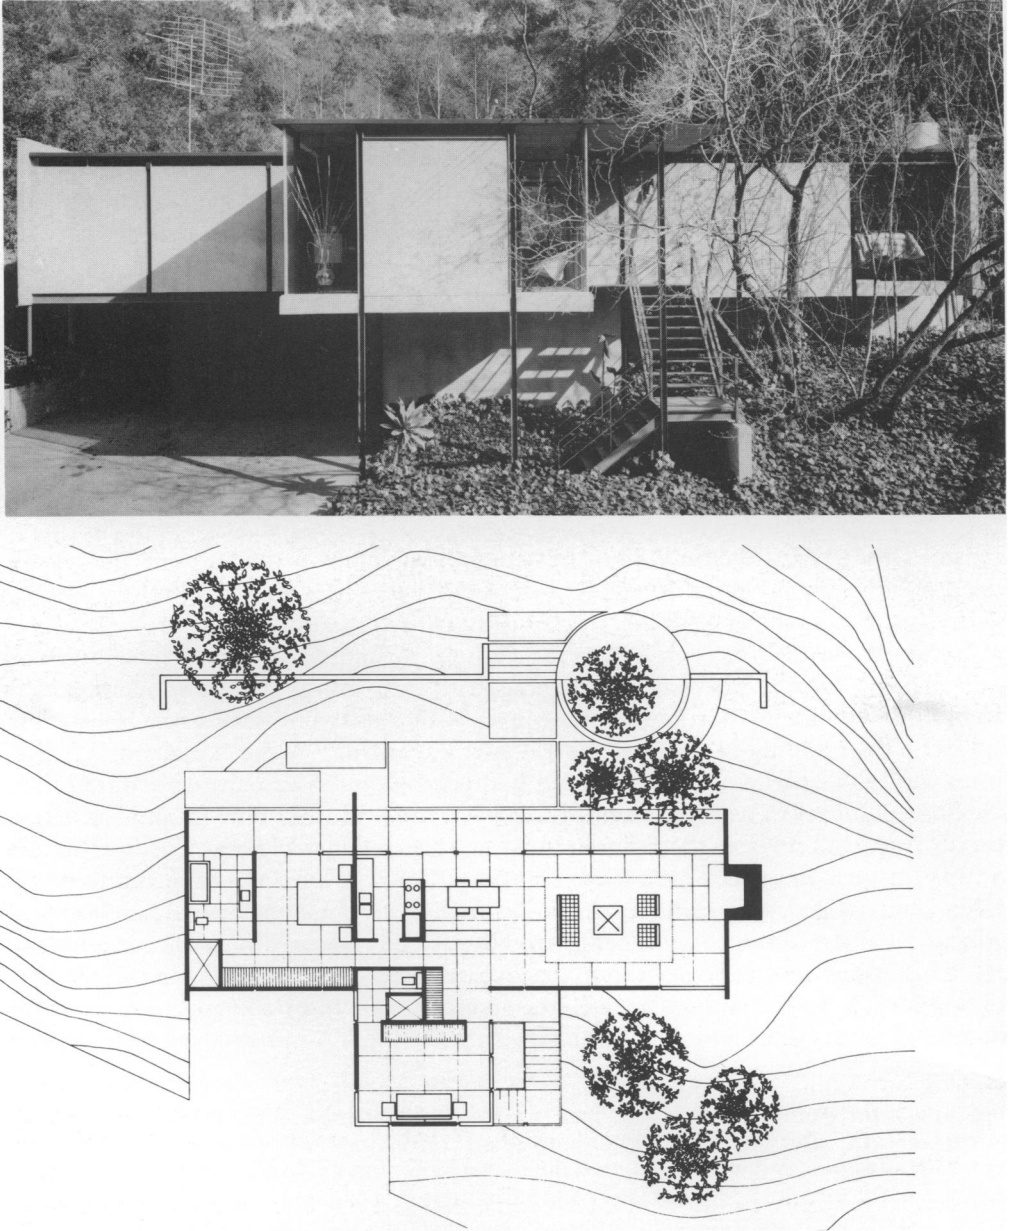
Craig Ellwood, The Hale House, Beverly Hills* a. exterior, b. plan
